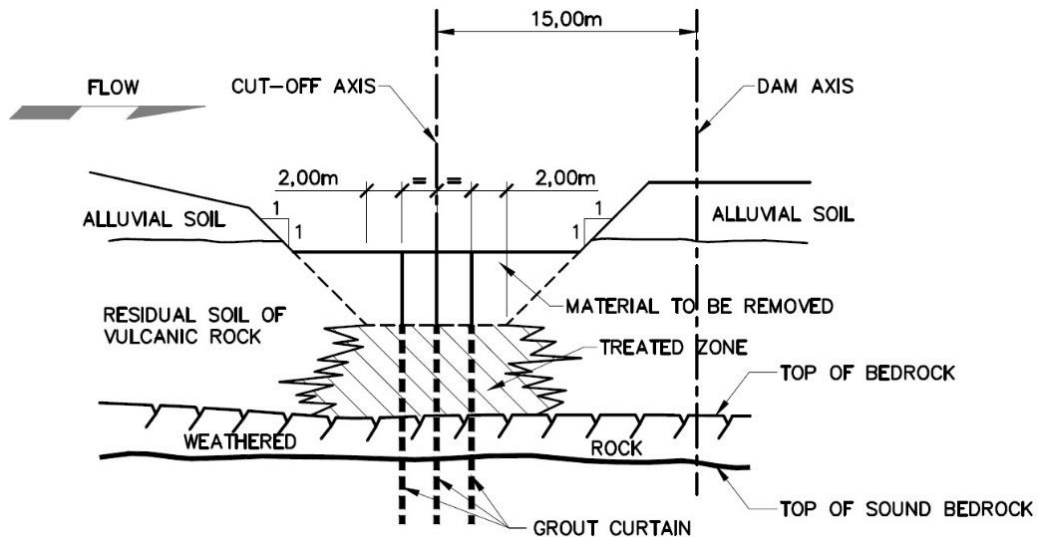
Balbina Dam foundation treatment typical cross section
